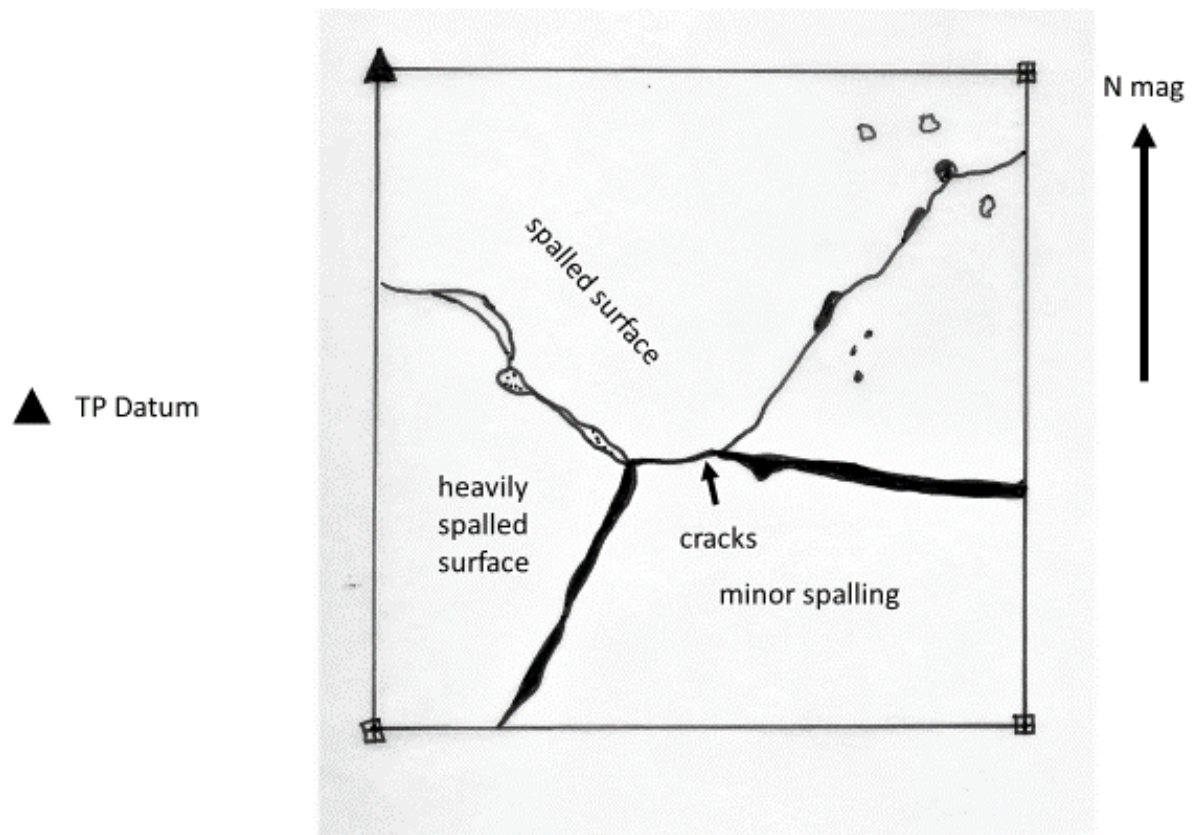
Feature I-7, TP-C Platform Floor/Plan Drawing
